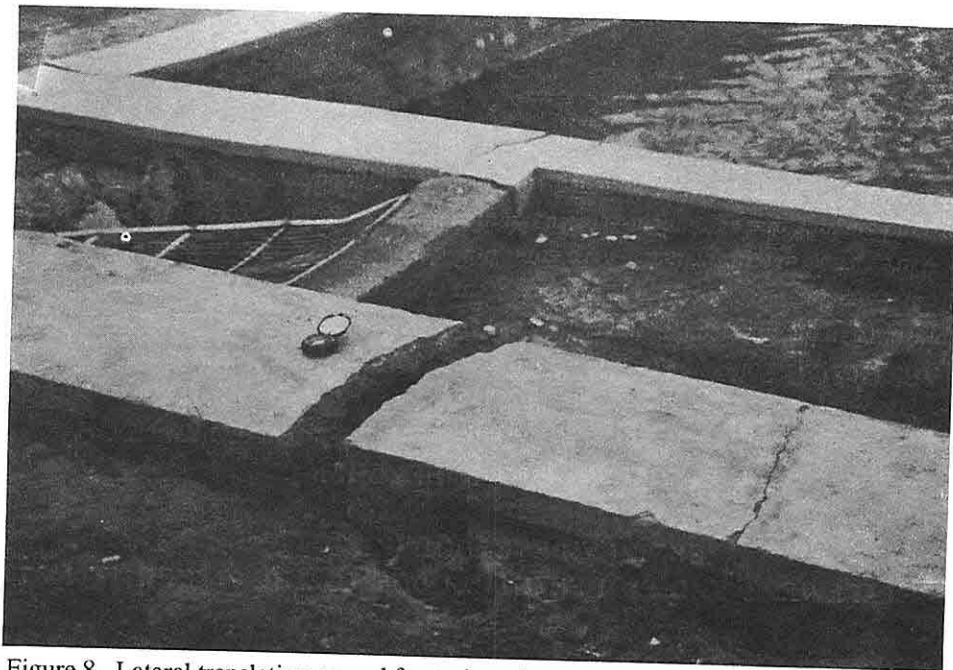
Lateral translation caused fracturing of retaining wall with associated tension crack in backfill.
